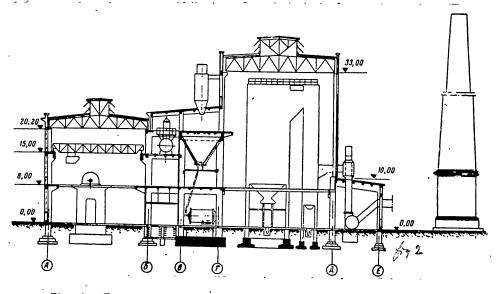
Frame construction entirely in precast reinforced concrete.
